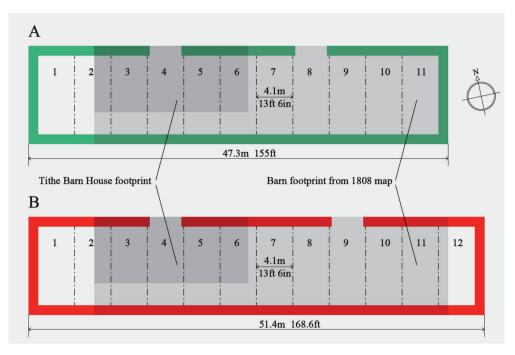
Drawings showing the suggested original plan and bay structure of the barn if of 11 or 12 bays. Drawing by Mark Fenton.
